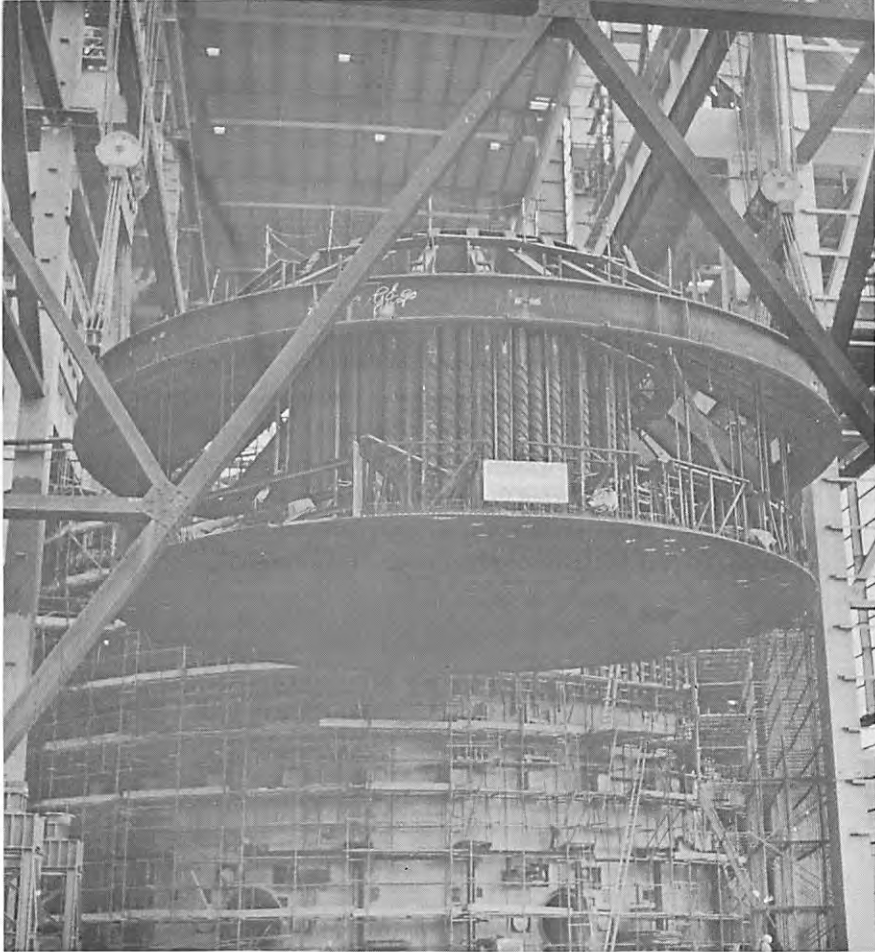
LIFTING IN THE LINER TOP, STANDPIPES AND CONCRETE SUPPORT STRUCTURE - HINALEY POINT 'B'
